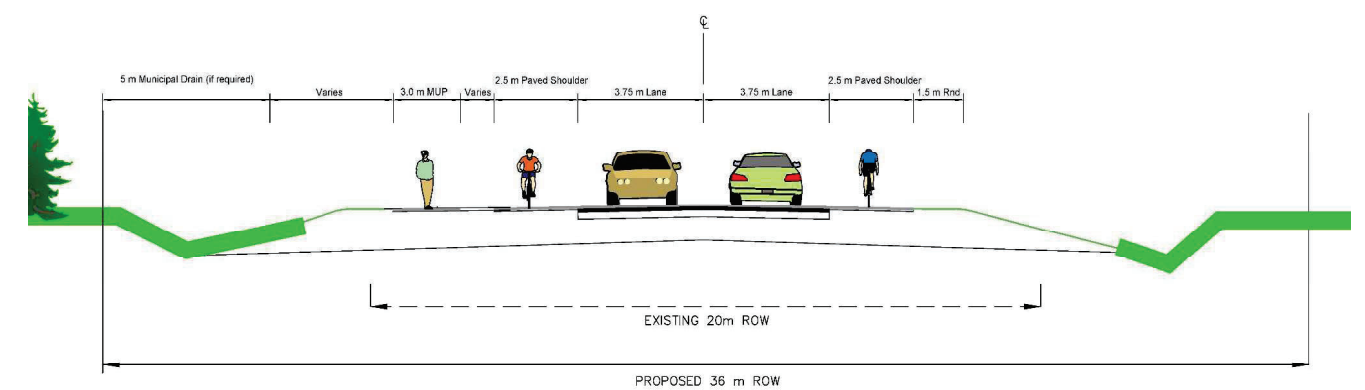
Concession Roads 8 and 9 – Alternative 1 - 2-Lane Rural Cross Section with Bike Lanes and a MUP
